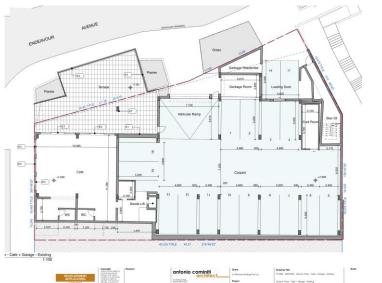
Existing plan of garage level at 1605 Anzac Parade (Source: Applicant).
